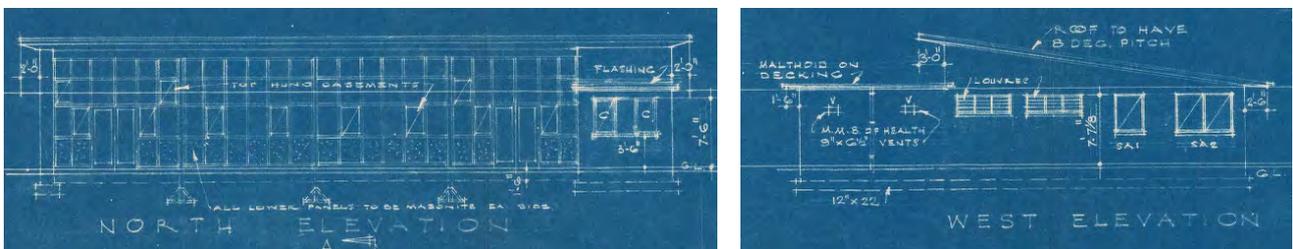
Drawings relating to building permits 3552 and 3622 (K Popper, undated). North and west elevations of the proposed kindergarten rooms. (Source: Council Building File)
